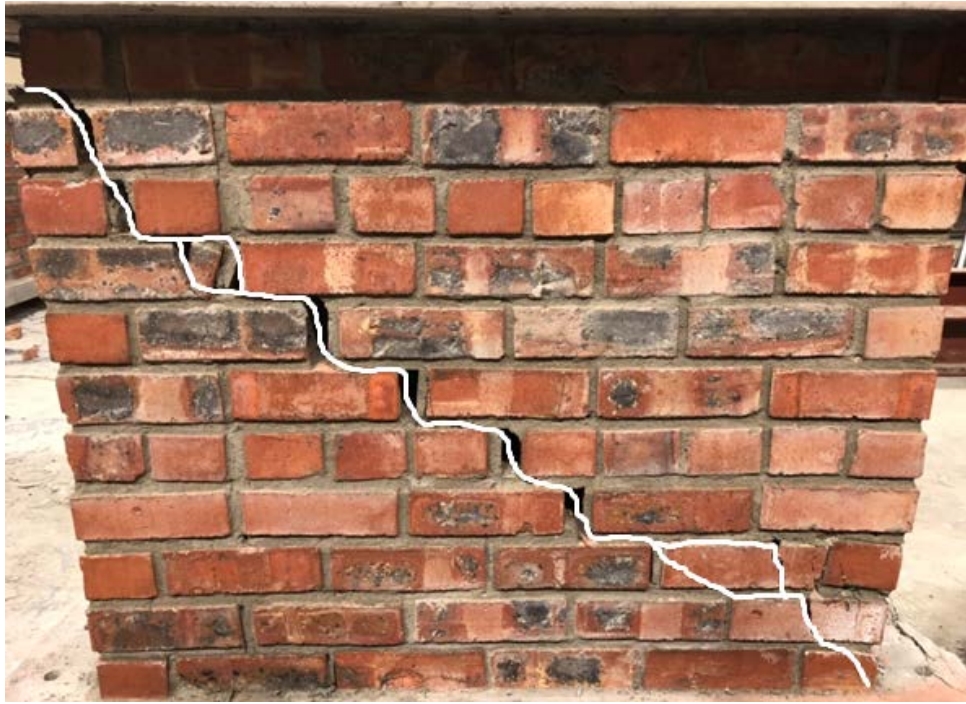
SW-100-200-01 crack pattern in the masonry.
